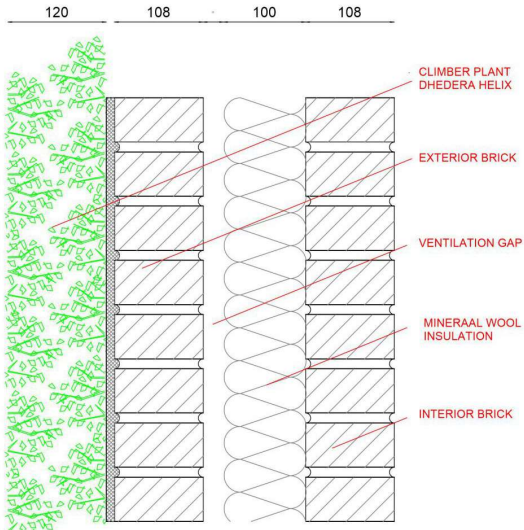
Scrapped living wall (Source: [ARCHITECTSJOURNAL 2018](#))
